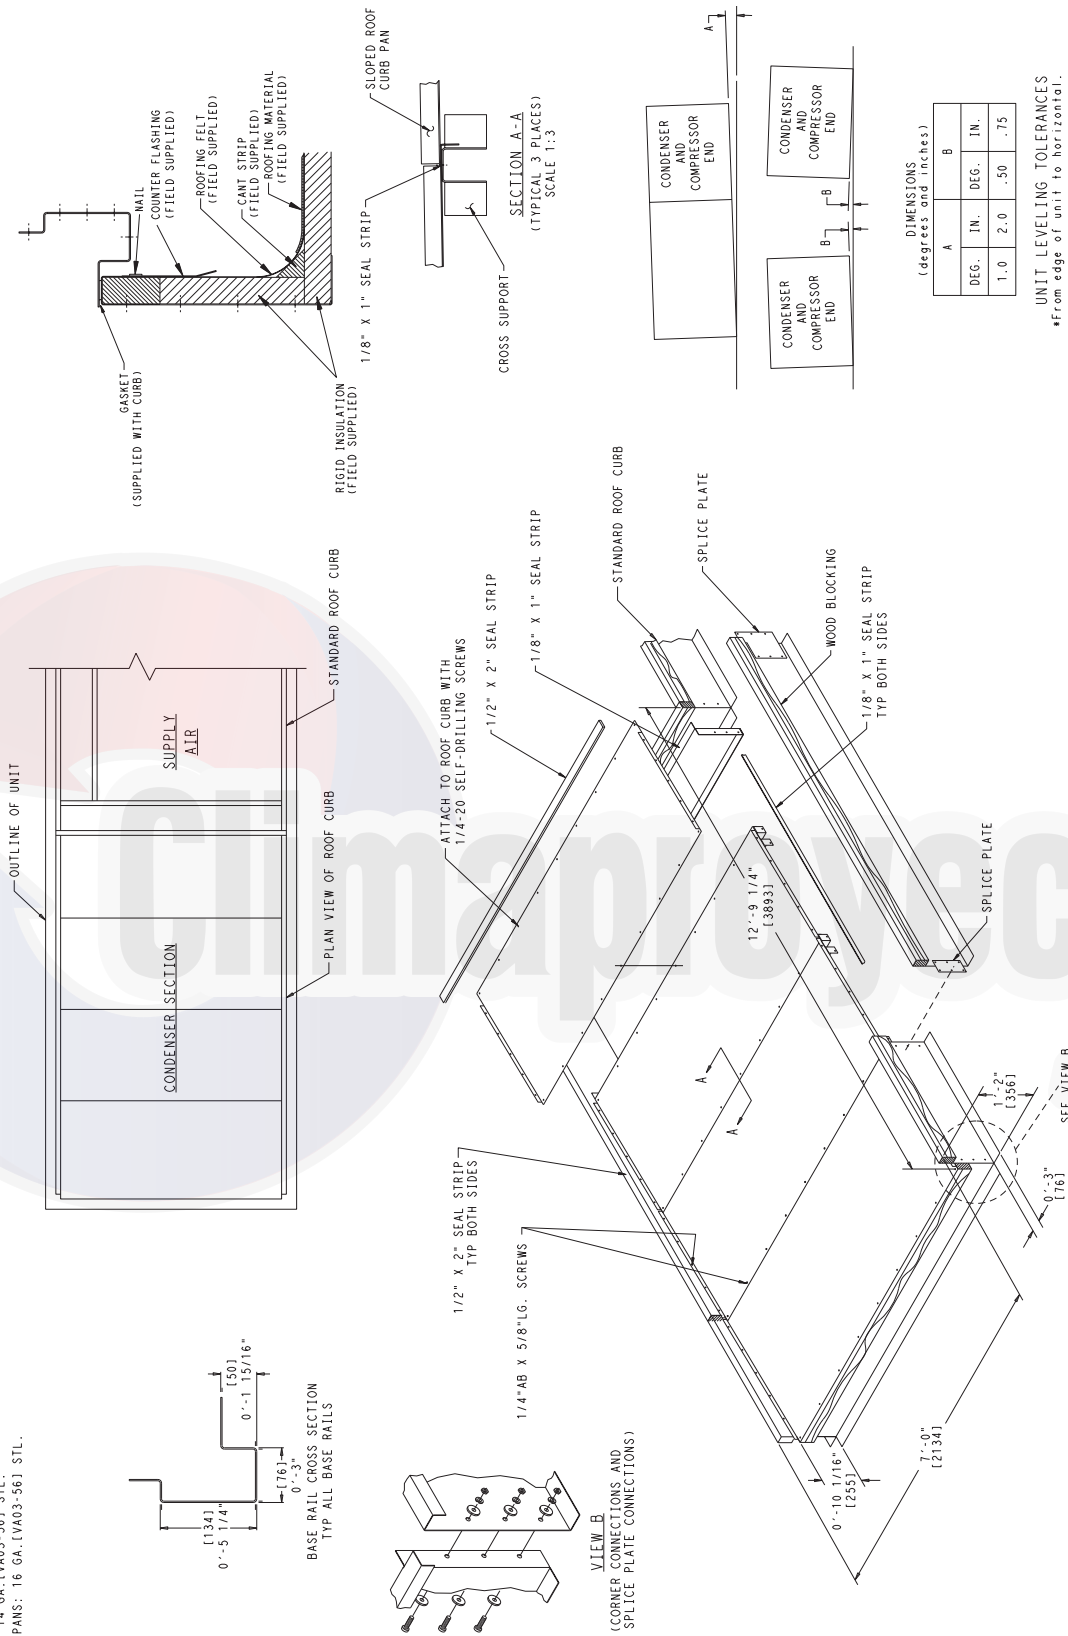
Condenser Section Roof Curb (Sizes 090 and 100)
